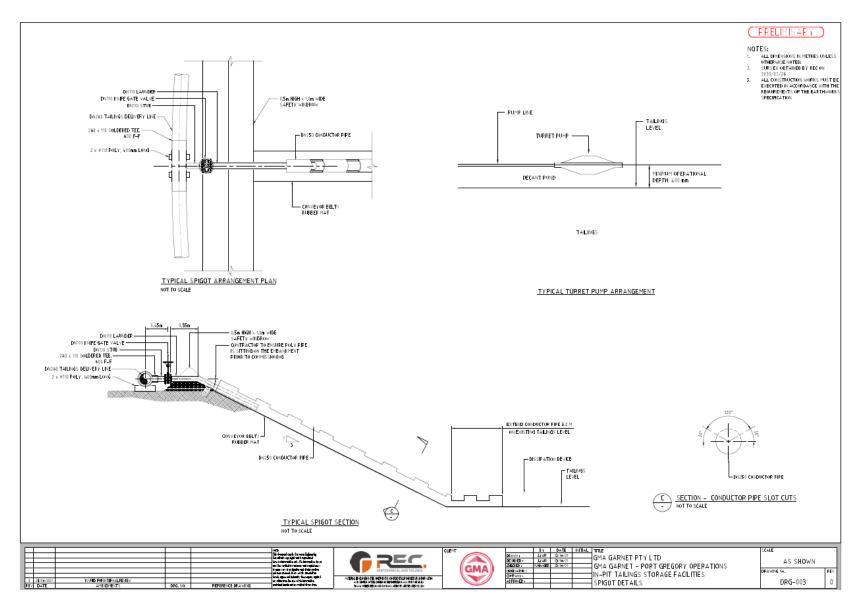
Decant water return system for solar ponds approved under W6584/2021/1 and for new modified tailings storage ponds
